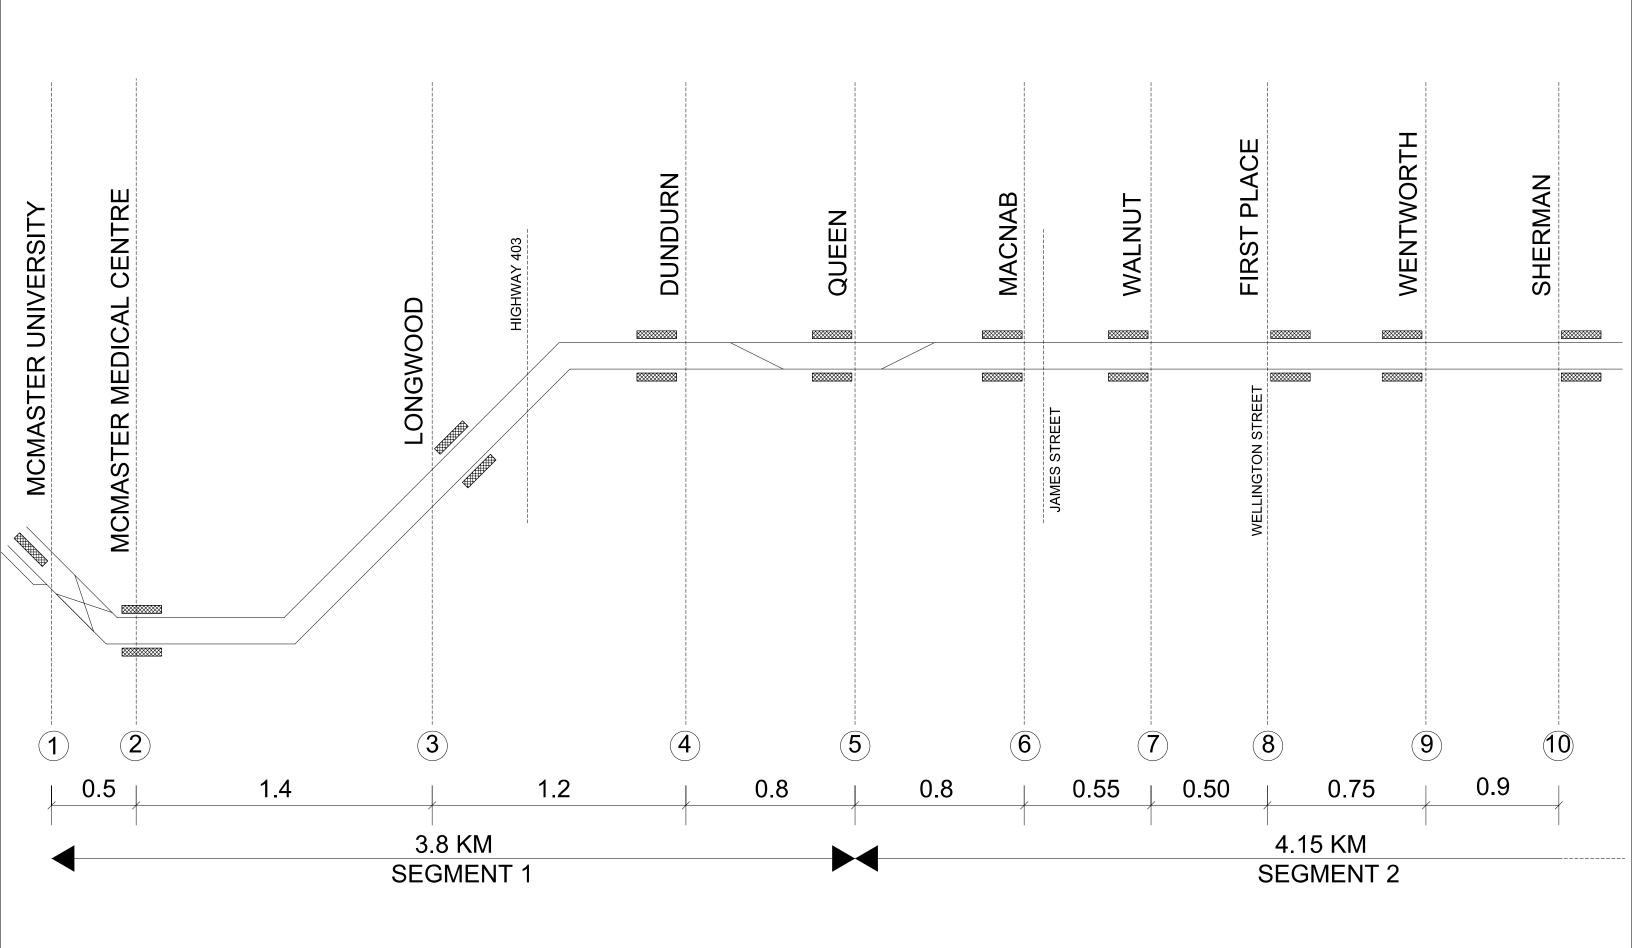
PROPOSED TRACK PLAN (PART 1)
